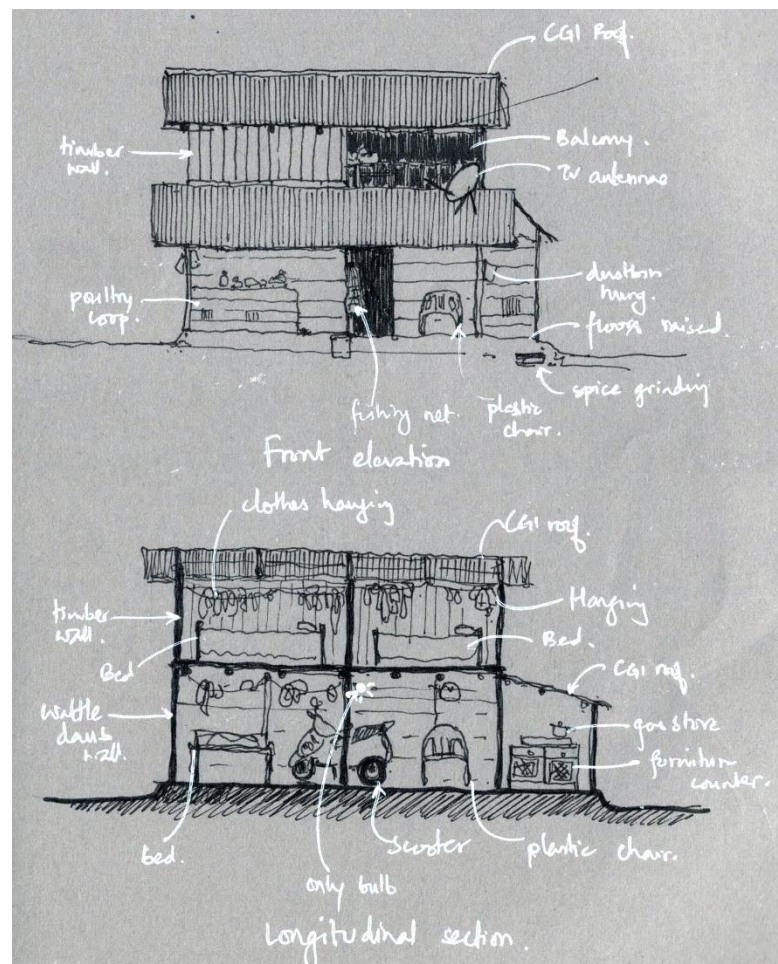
Front elevation and longitudinal section of the *Mahato* family in the Bhutaha Tole depicting material constructs and internal spatial arrangements. - sketch by the author.
